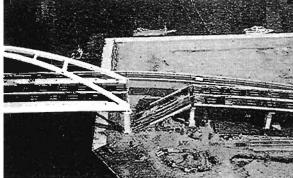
Nishinomiya Harbour Bridge on the Hanshin Bay Expressway Approach span fell due to loss of support as main pier shifted towards main span.
